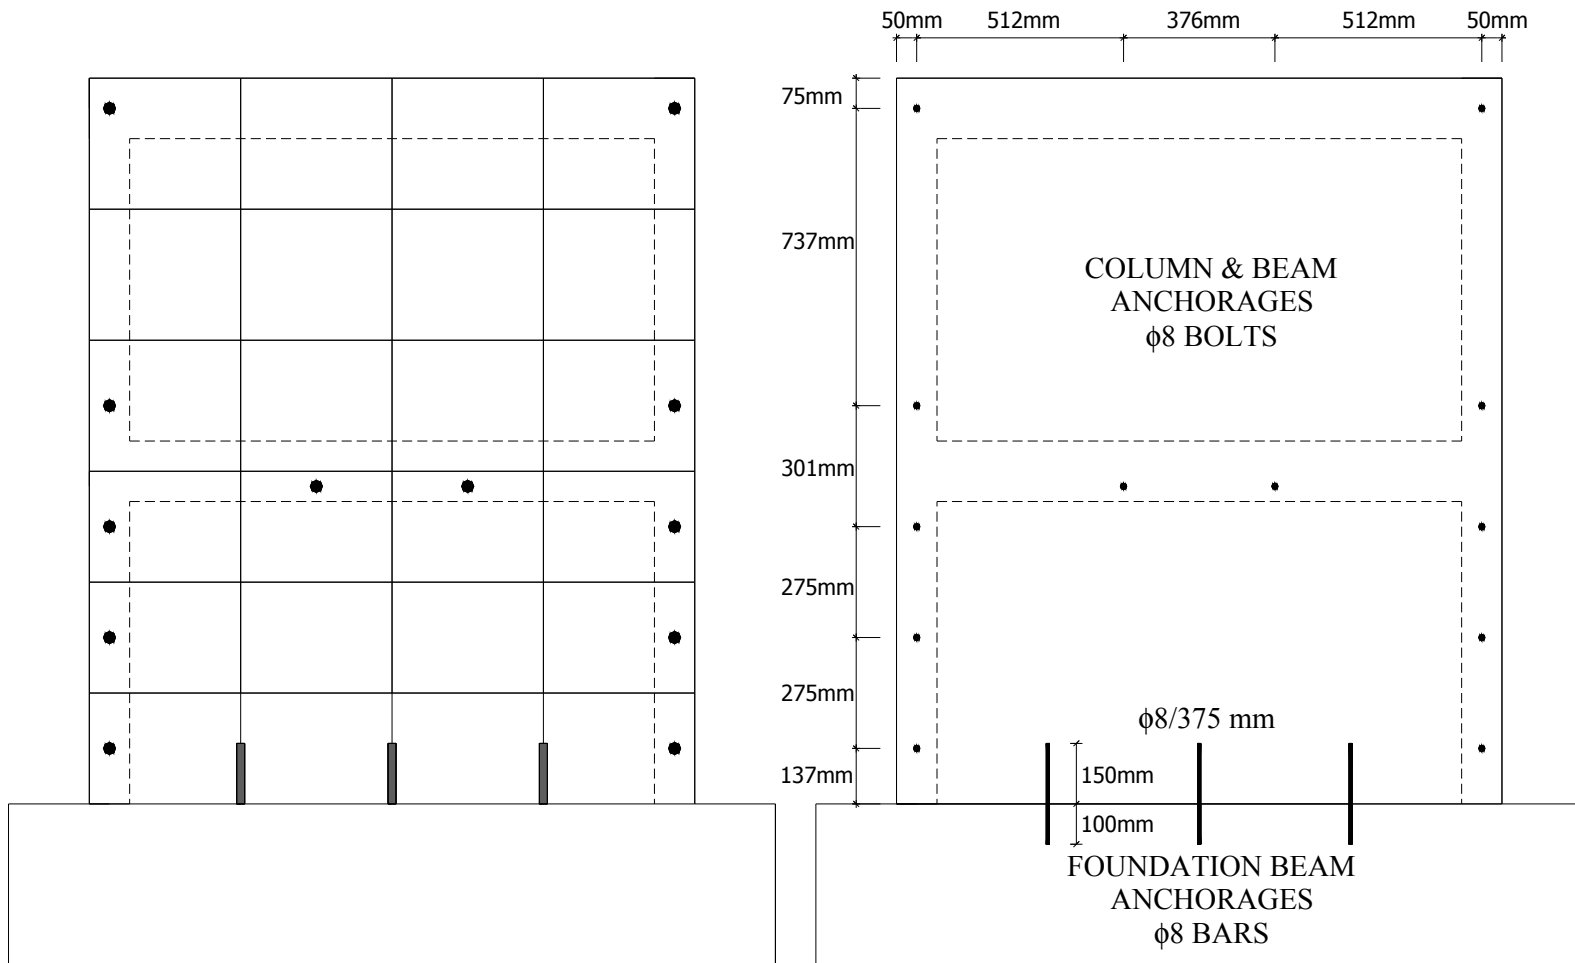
Panel arrangement and configuration of the dowels for Specimen CEER
